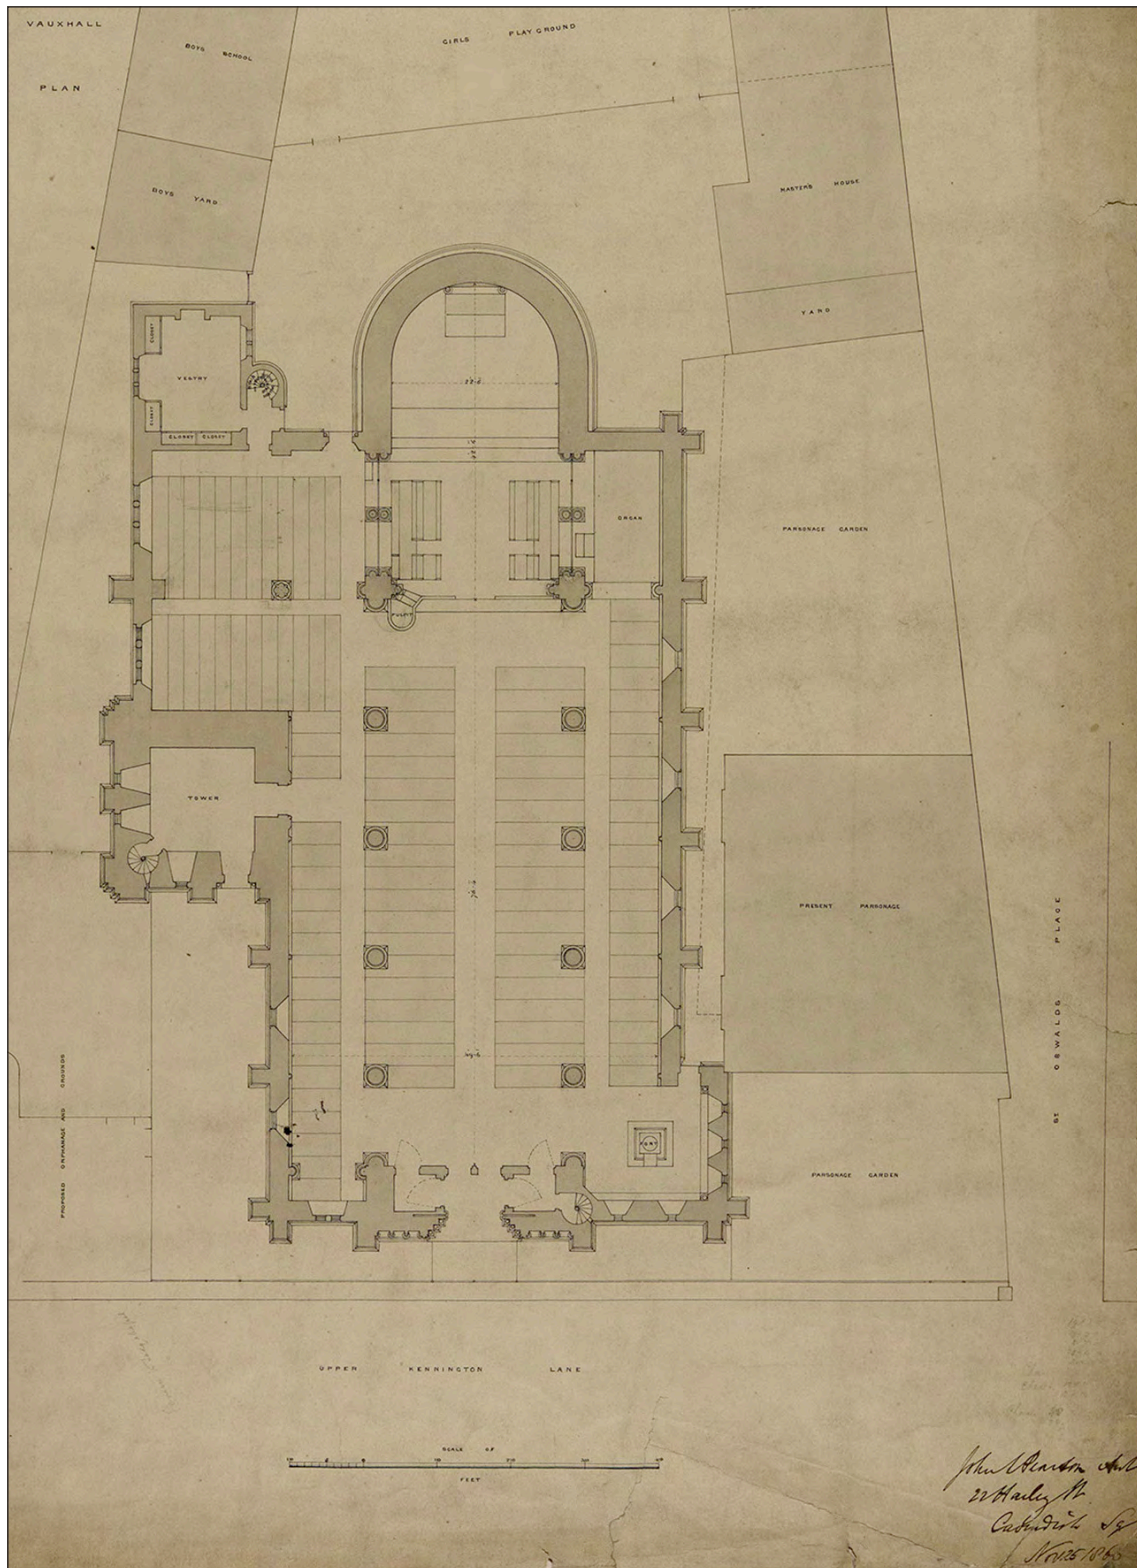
Ground-floor plan of the Church of St Peter, dated 1860 (PB 313/5 1© RIBA Archive)
